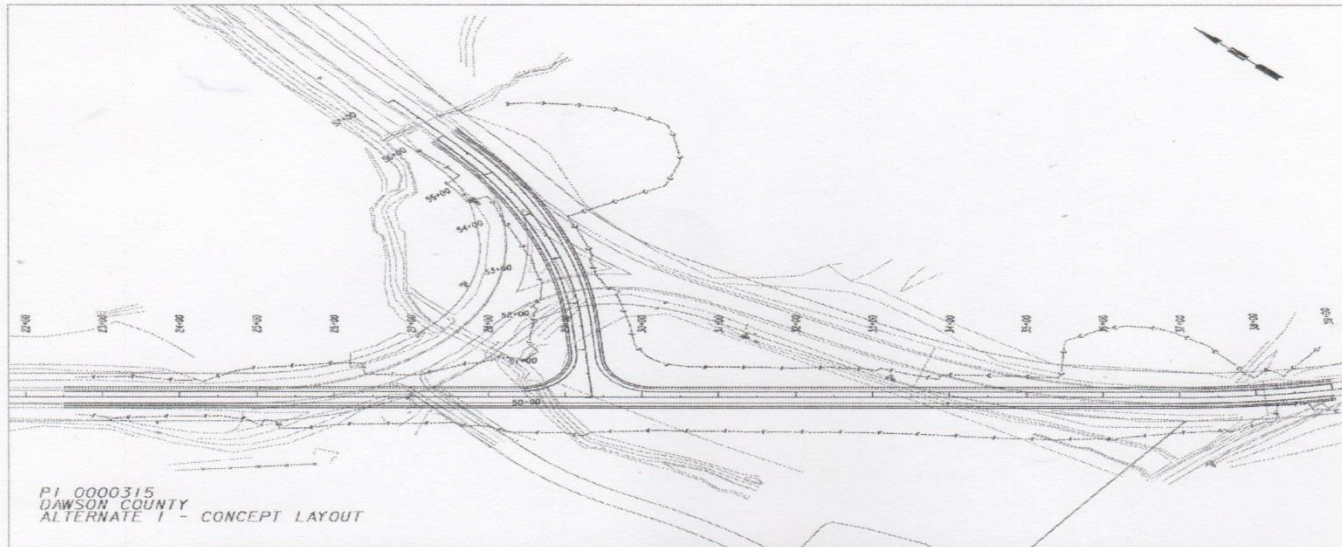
Alternate 1, T-Intersection to West of Existing Y-Intersection
